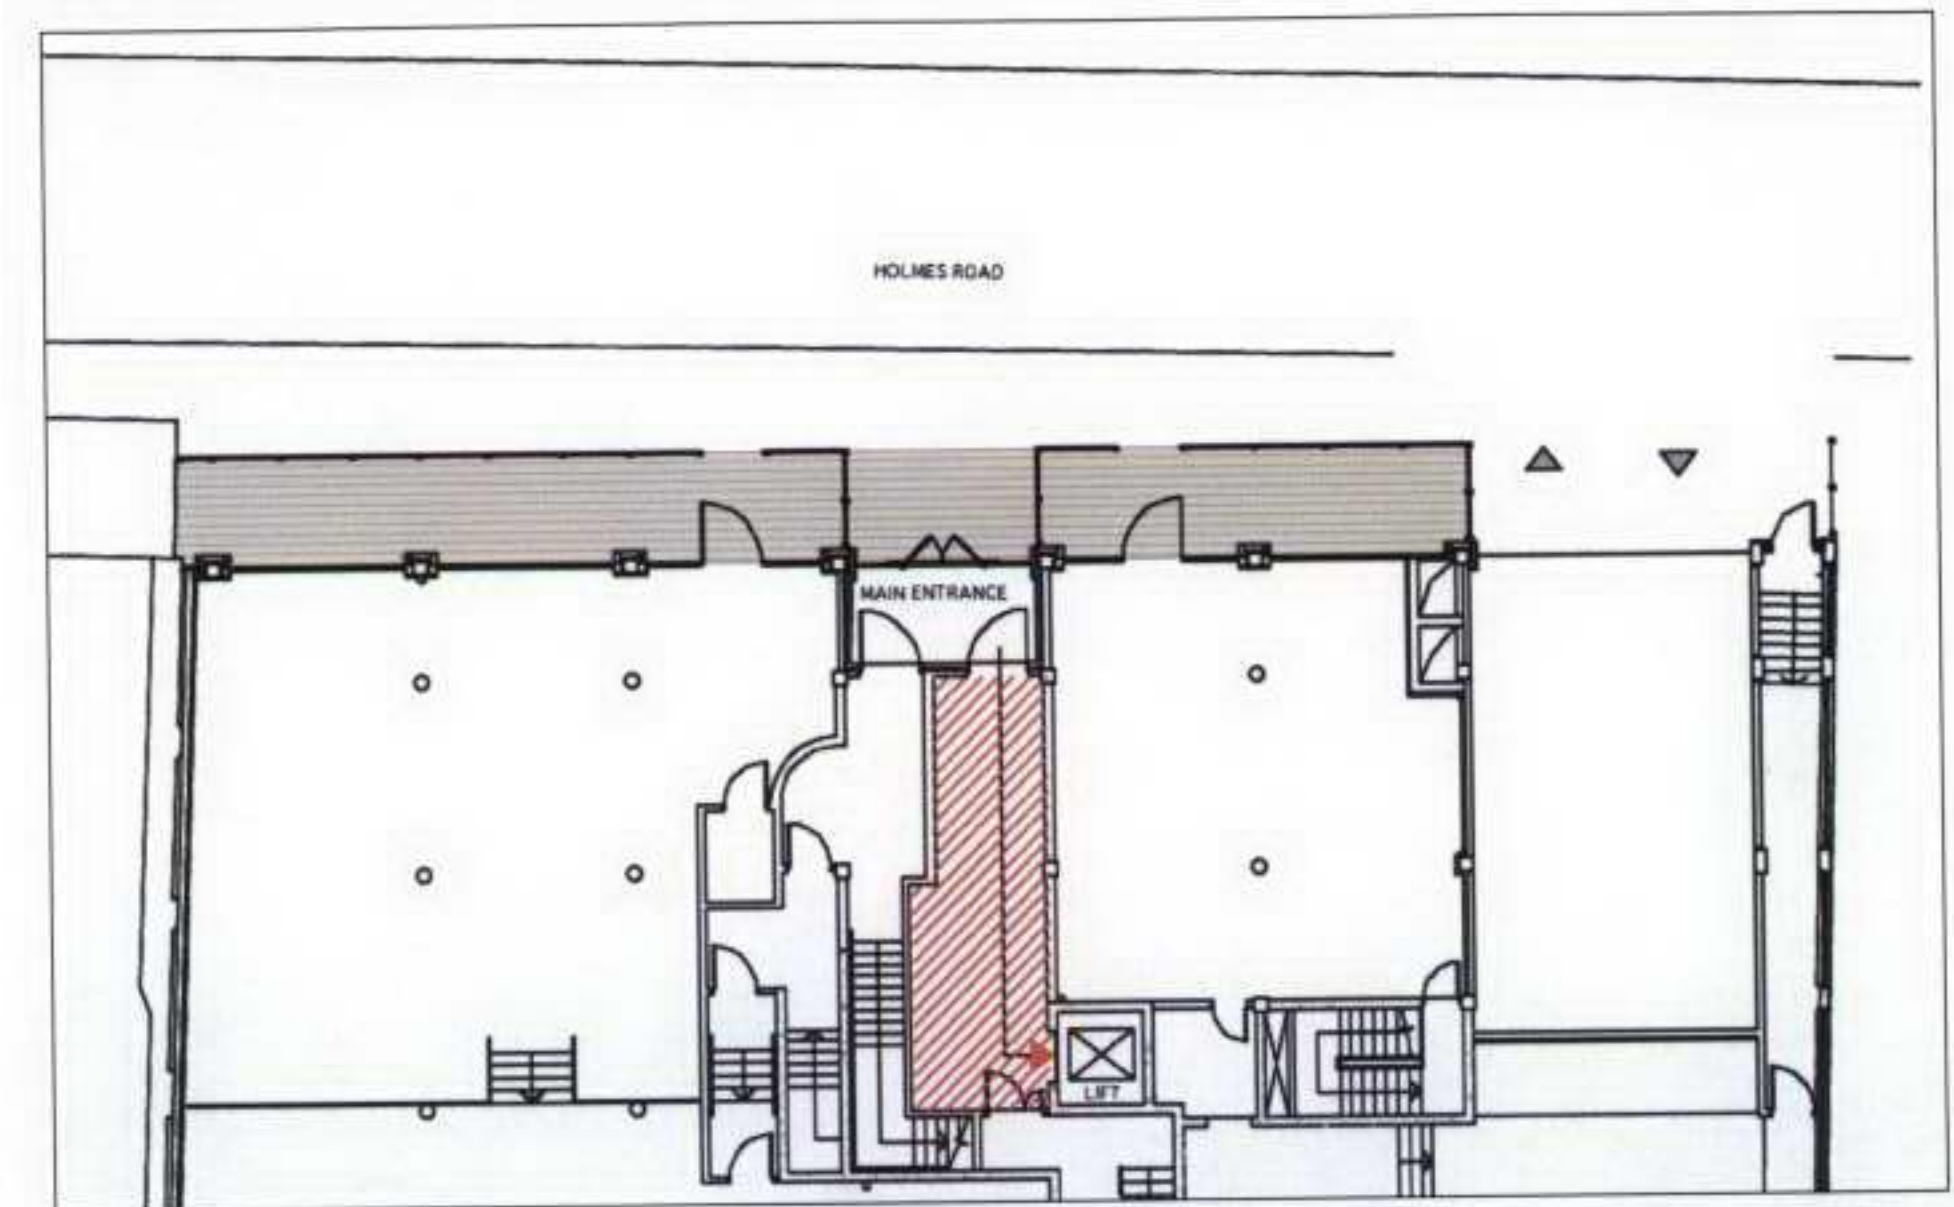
Ground floor plan detail of the existing building at 55 Holmes Road showing the main entrance and lift.
